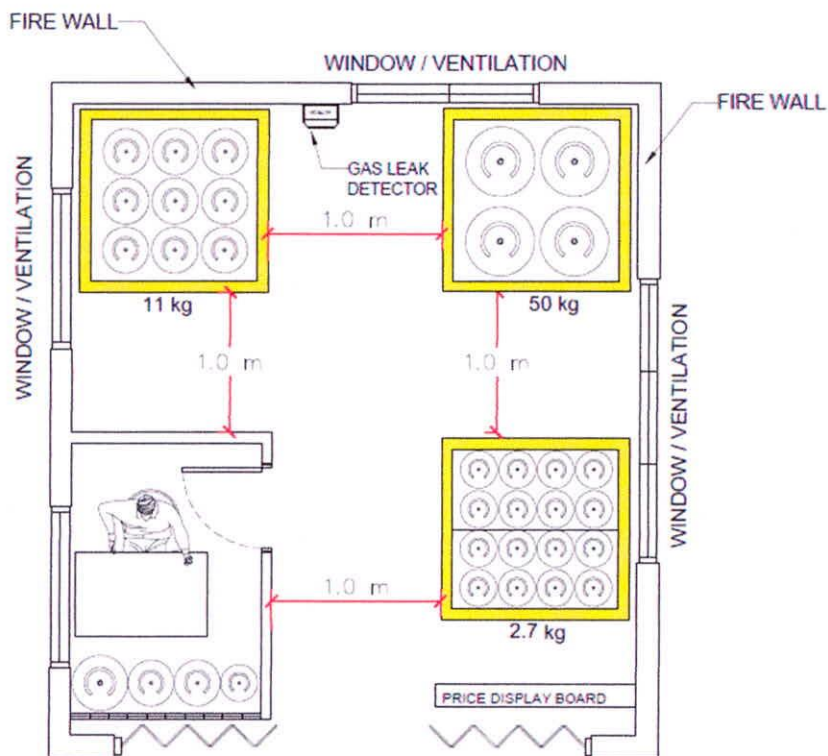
LPG Retail Outlet Sample Layout (Top View)
